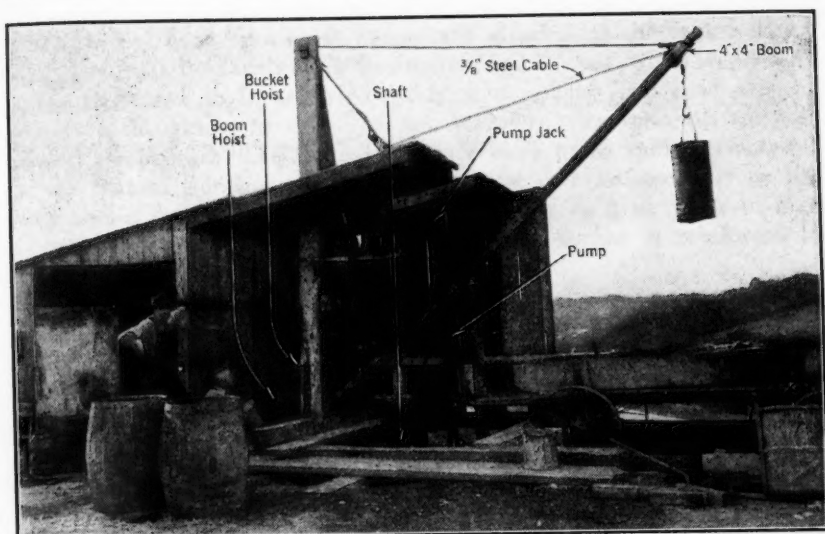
ARRANGEMENT AT SHAFT HEAD, GERMANTOWN DAM, FOR SINKING TEST PIT.
